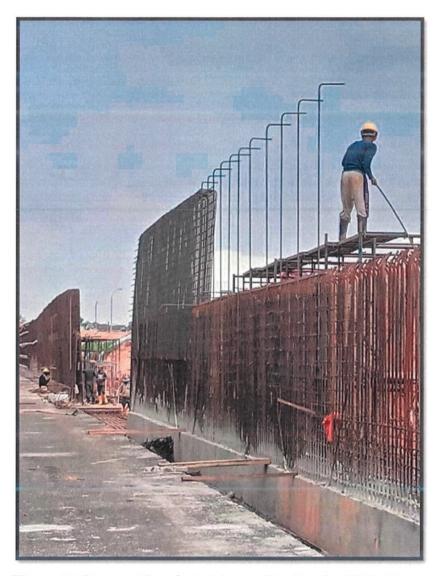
Construction of retaining wall in Bandar UDA Utama.
